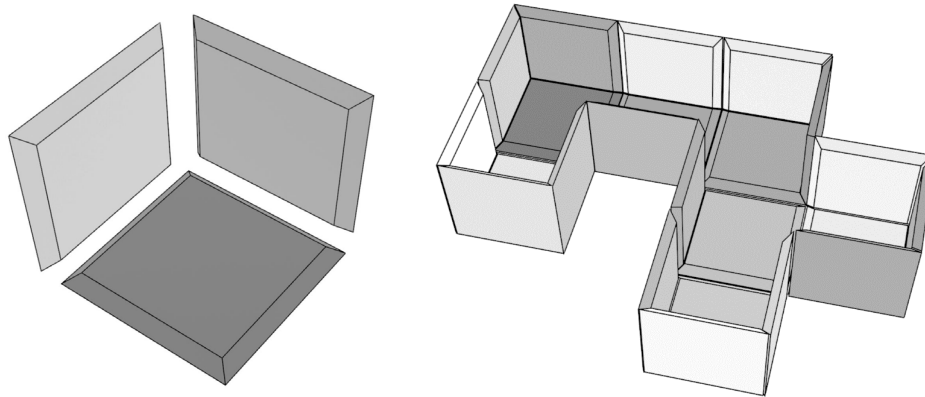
The modular panels assembling (left) and modular “cubes” juxtaposed (right)
